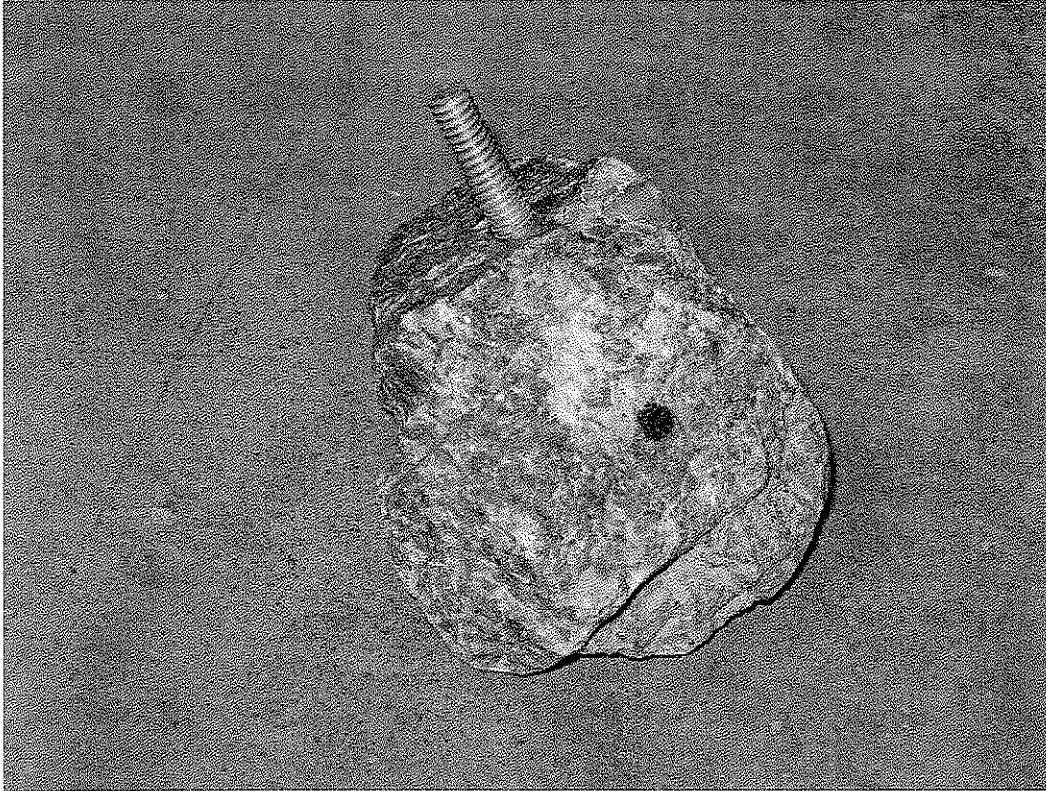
65 mm Diameter Specimen with Threaded Rod
